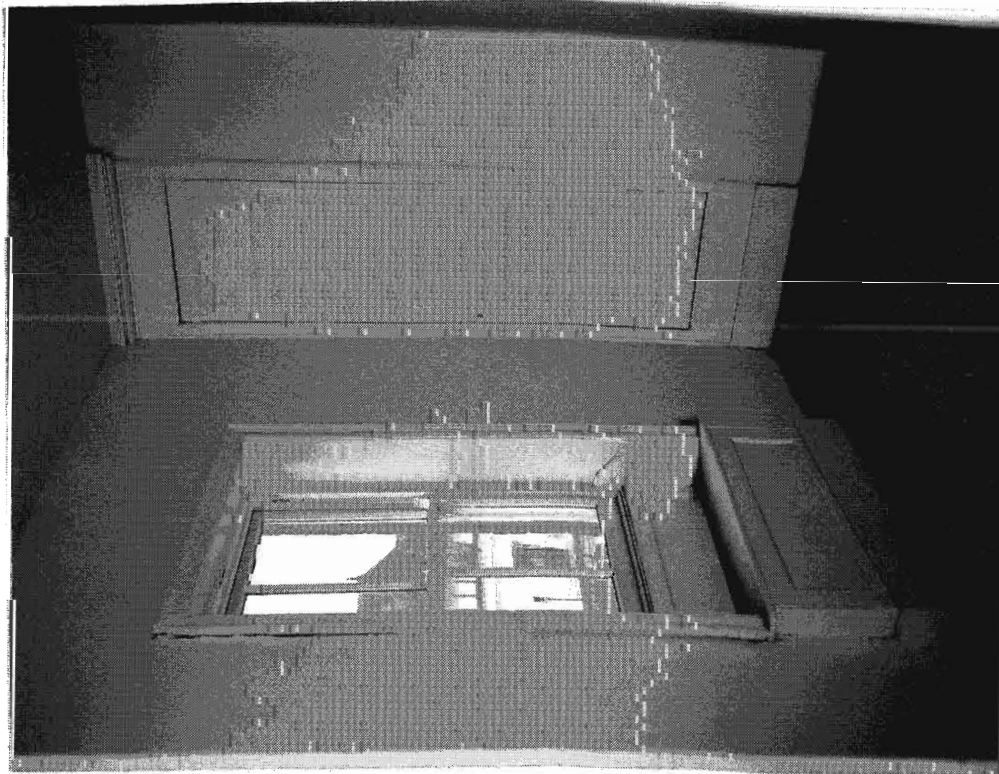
Second floor, 47 Market Street, showing wall cupboard and reduced window seat form at this level.
